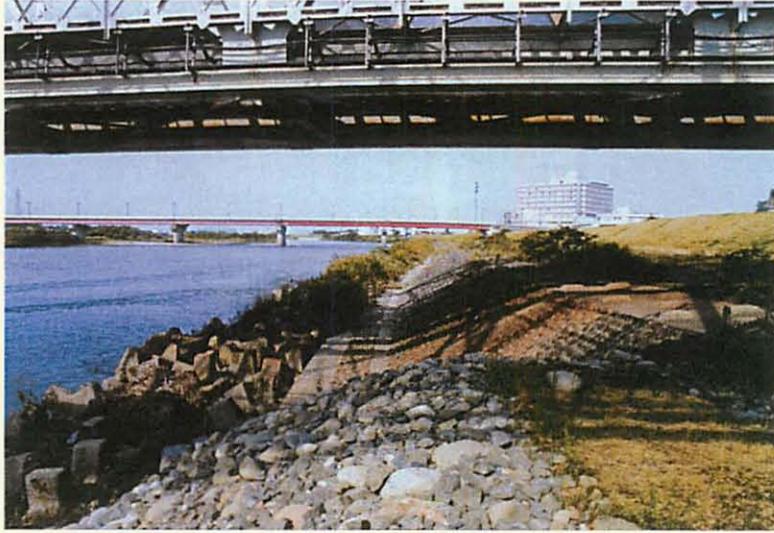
Bank for low water situated from Railway Bridge to North Toyama Great Bridge on October 7, 2004.
